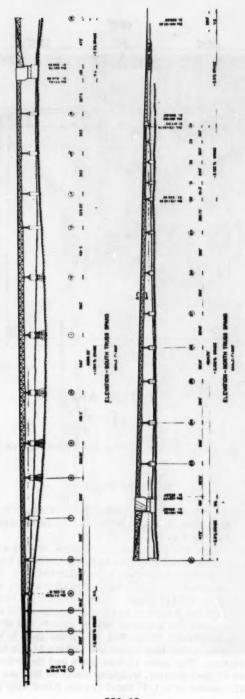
General Drawing of Continuous-Truss Approach Spans. (Elevation.)
